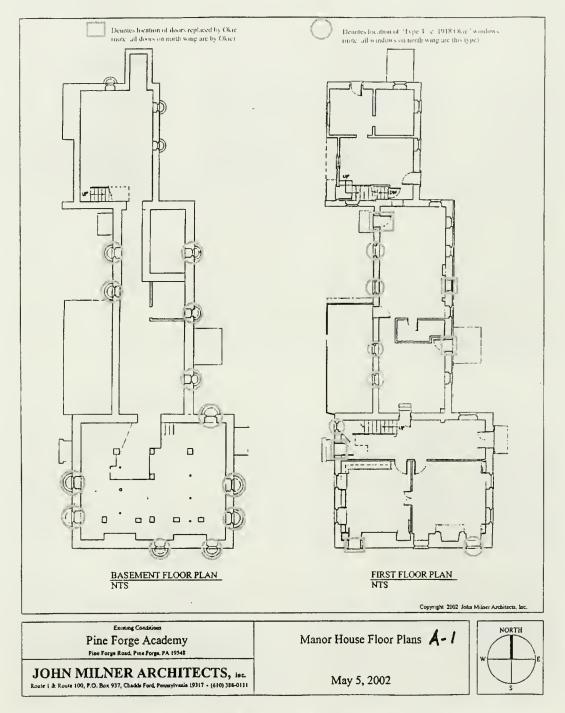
The Center Section and South Wing windows and doors that were altered during c. 1918 Okie renovation are highlighted
